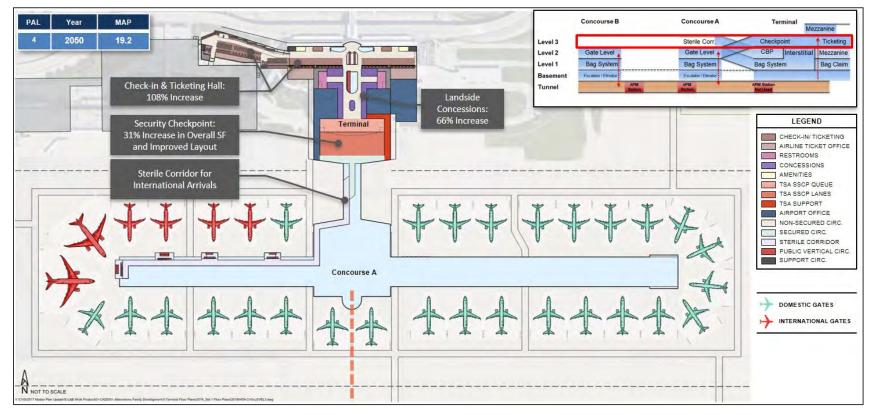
PAL 4 ENLARGED FLOOR PLAN – LEVEL 3 TERMINAL AND CONCOURSE A
